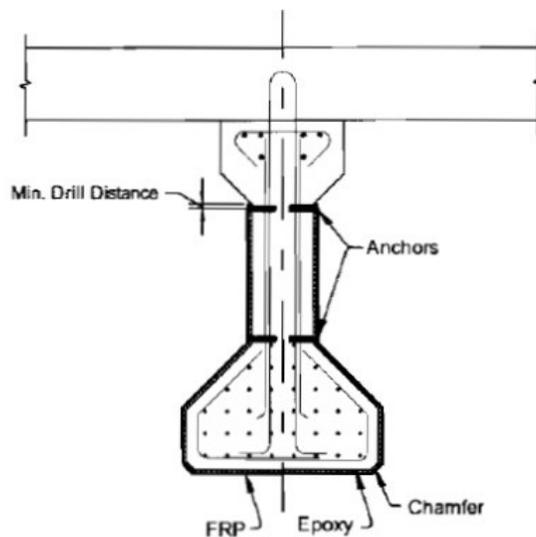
Arrangement of CFRP sheets and anchors for I-girder
